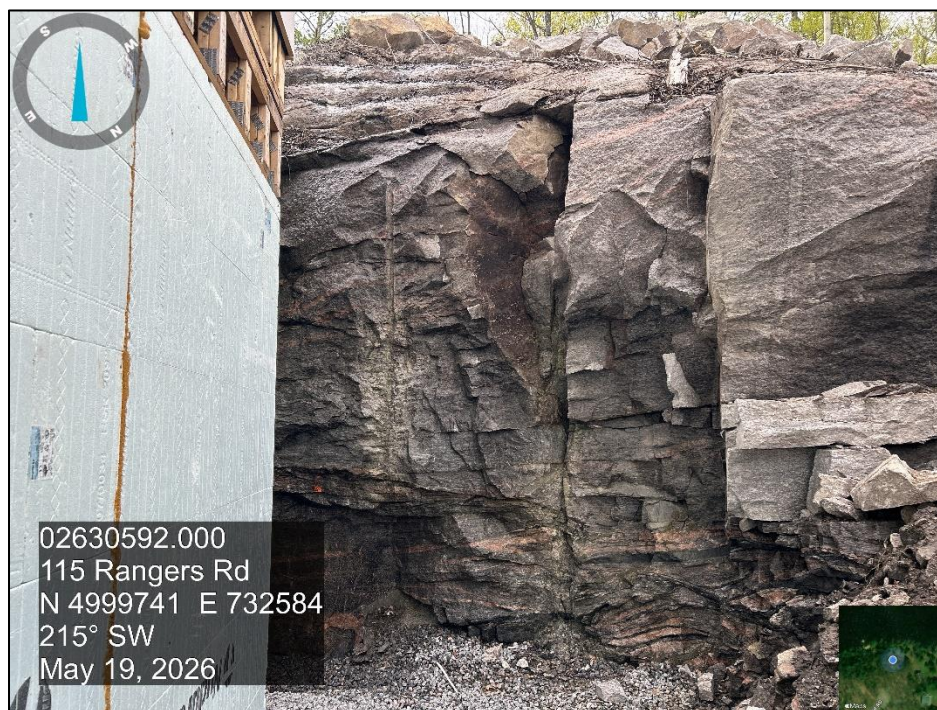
View of the slope face, looking south, showing the residential structure under construction and exposed bedrock. The granite bedrock shows little to no significant joints or fractures. The slope face is approaching near vertical. Stockpiled boulders are evident along the top of the slope.
